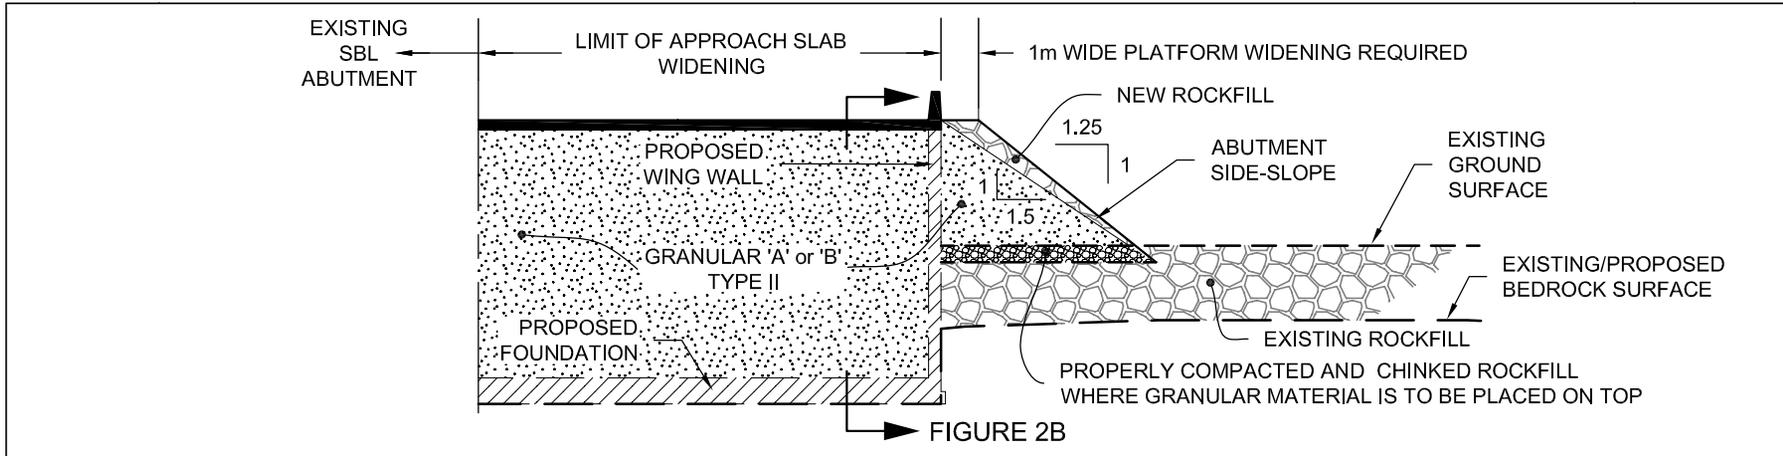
A - TYPICAL SECTION ACROSS APPROACH SLAB
